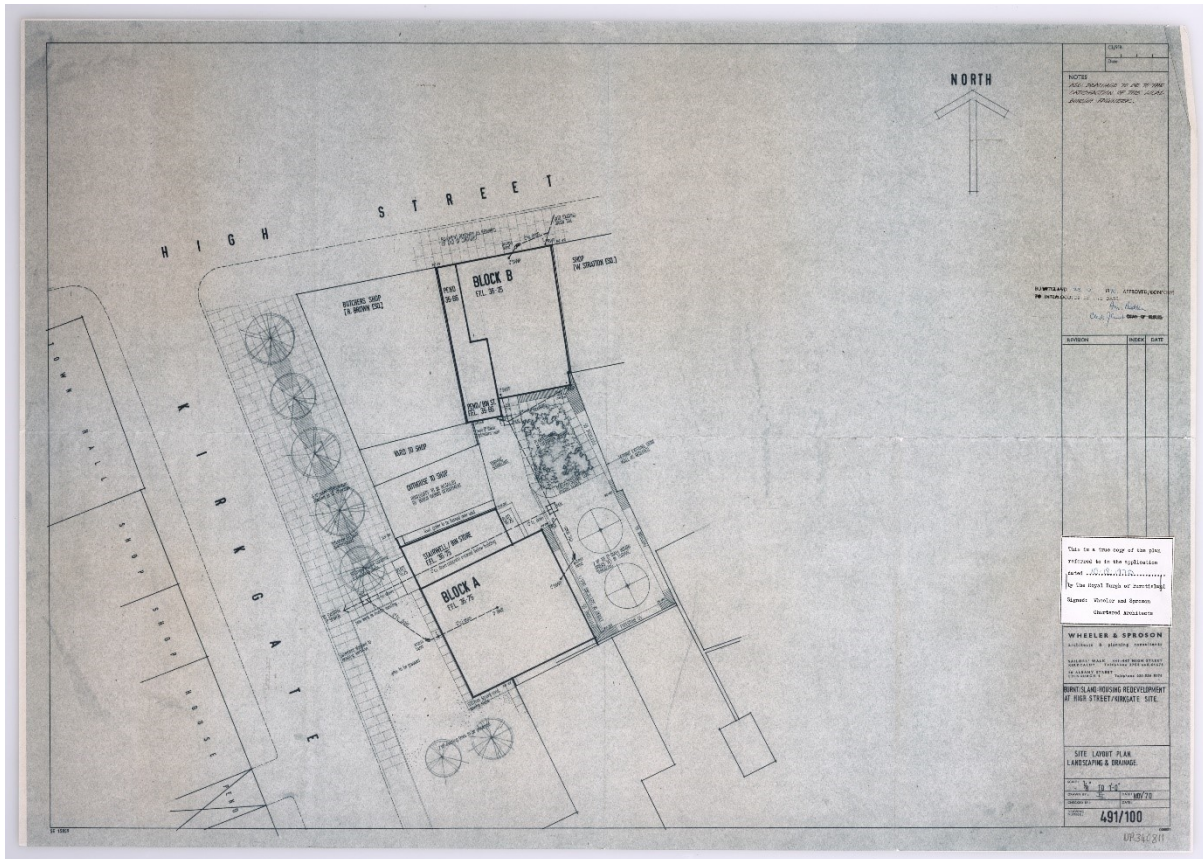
Final site layout for Kirkgate/High Street (Job 491), including landscaping and drainage, November 1970.
